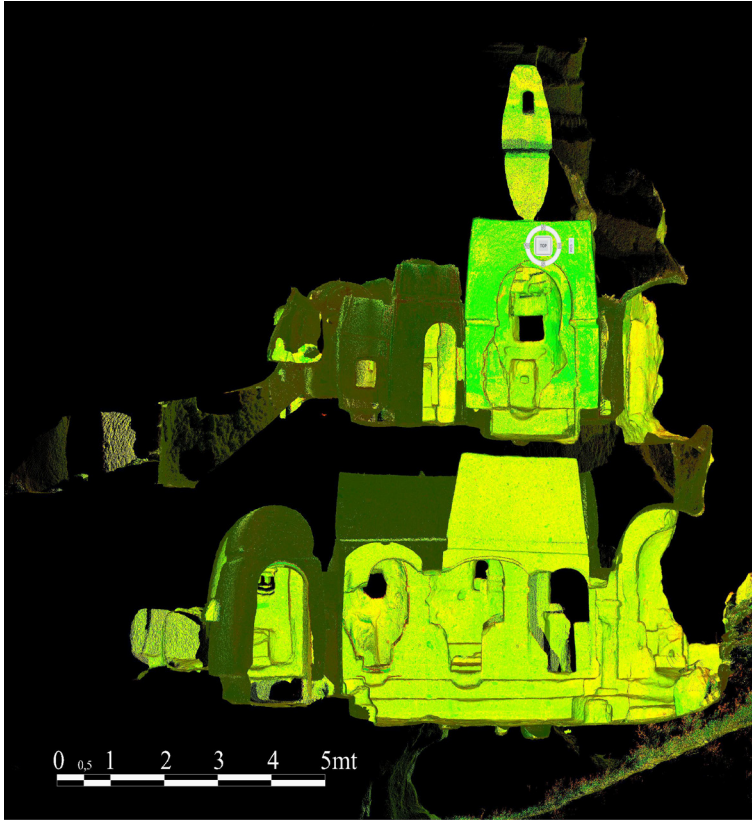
Kubbeli II, upper and lower churches, north-south section, looking east (author)
